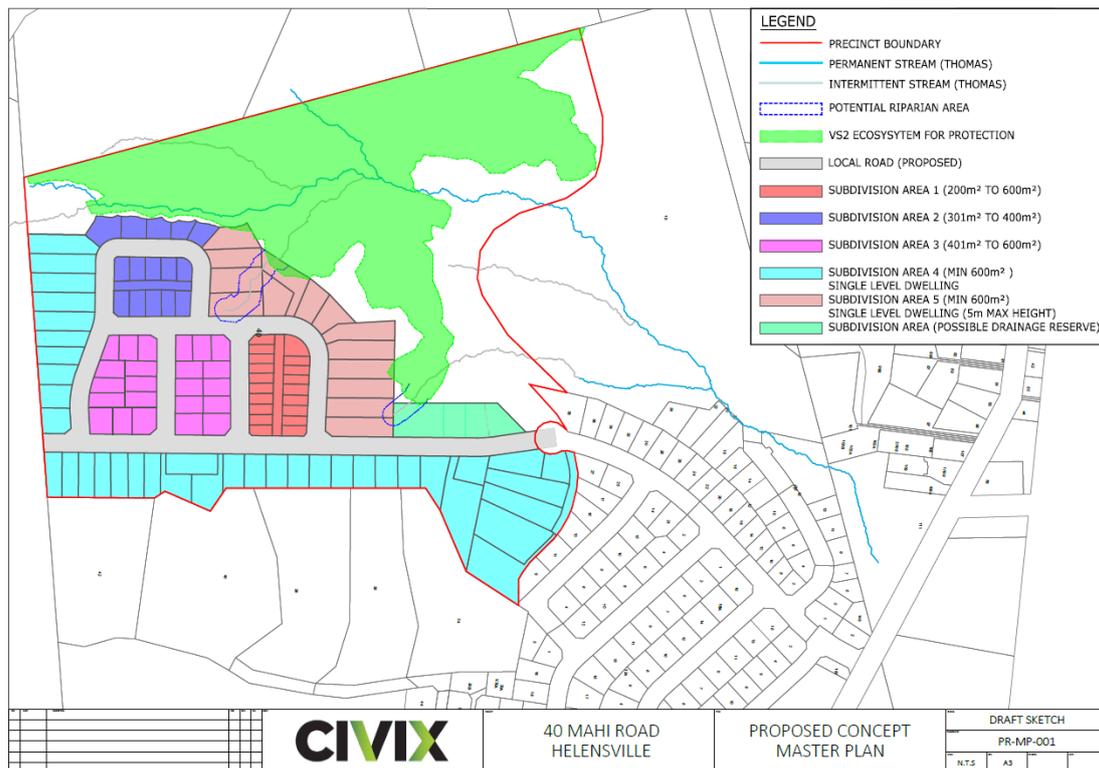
Proposed draft concept master plan by Civix, dated August 2024.
